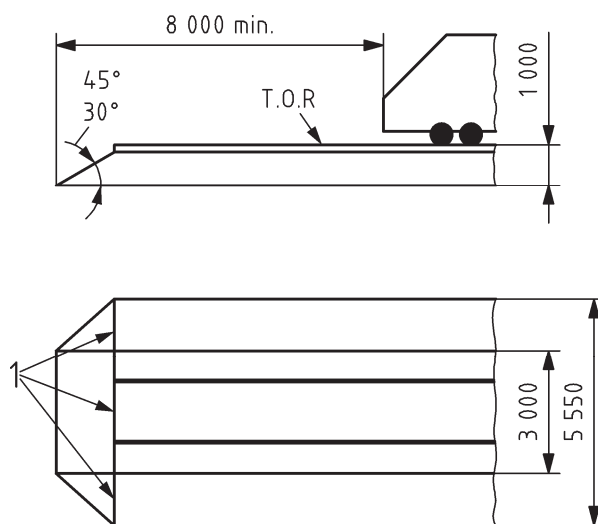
Sketch of the wind tunnel configuration single track ballast (front view, 1:1 scale)
